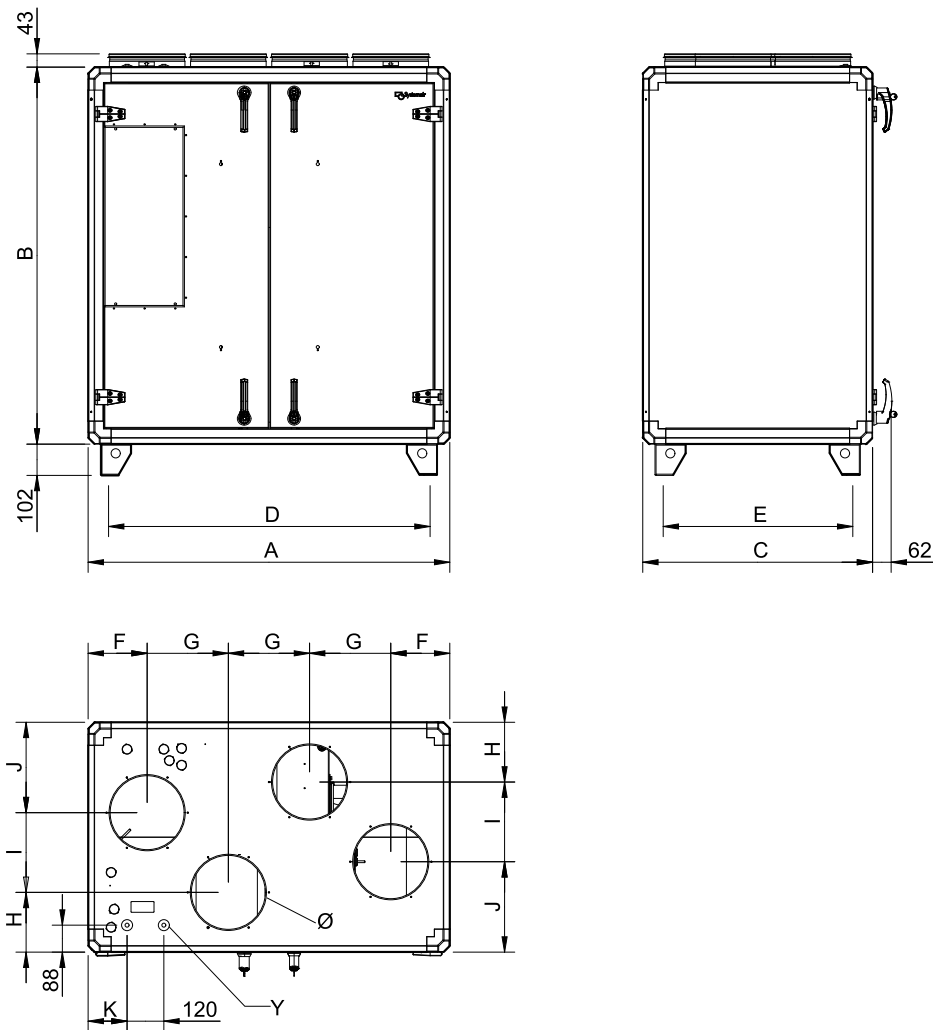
Dimensions (mm) TR03, TR04 (Drawn as a left hand unit)
